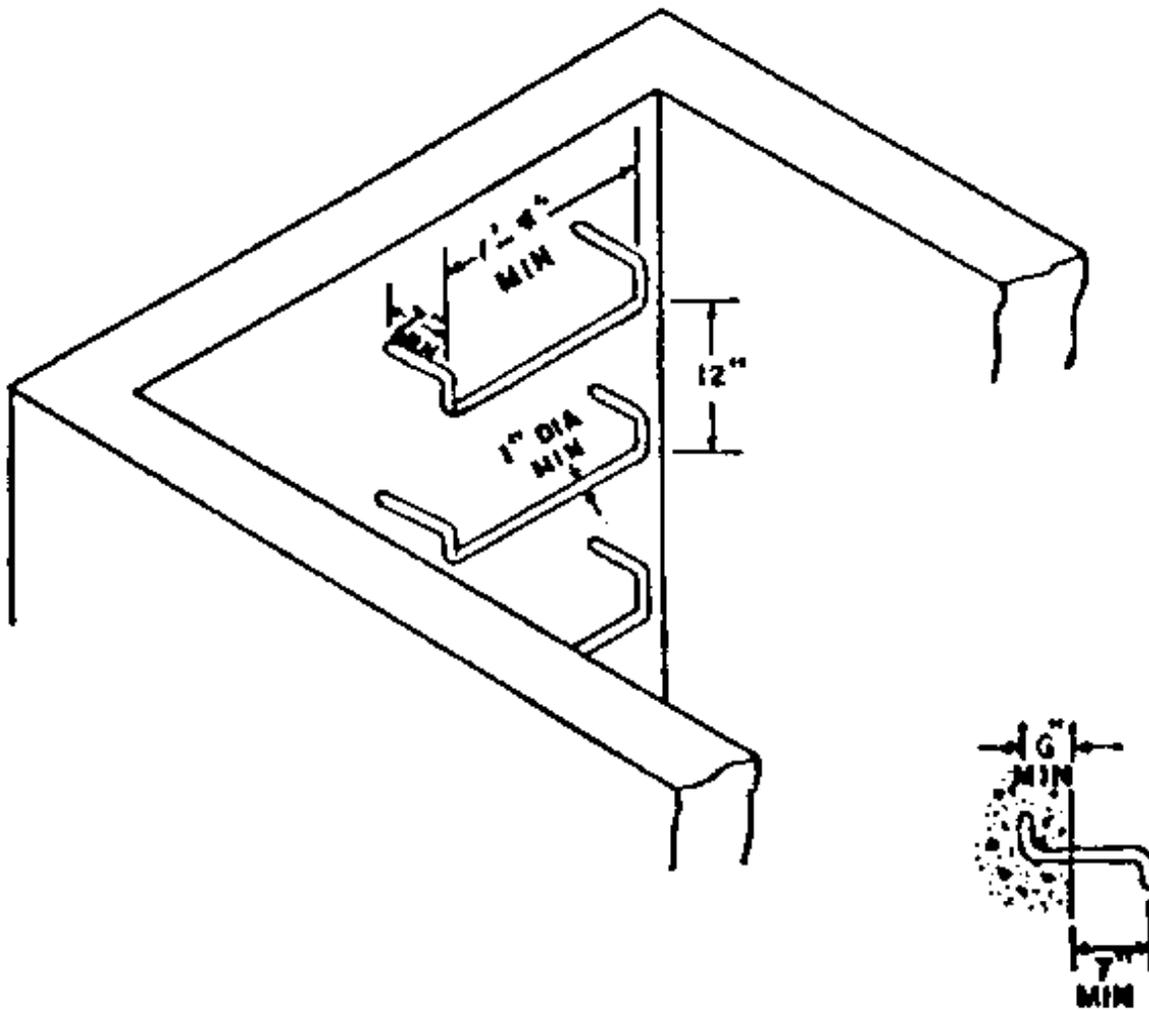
Suggested design for rungs on individual-rung ladders.
